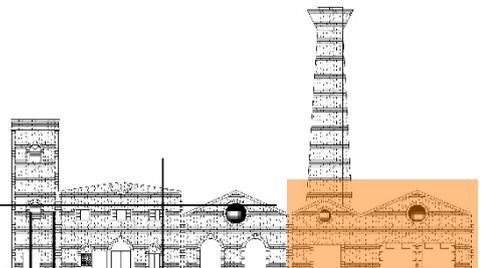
South-East Elevation - Paint over Surface - Barrack C and D, 15 to 17A, East Wharf, KPT, Karachi.
